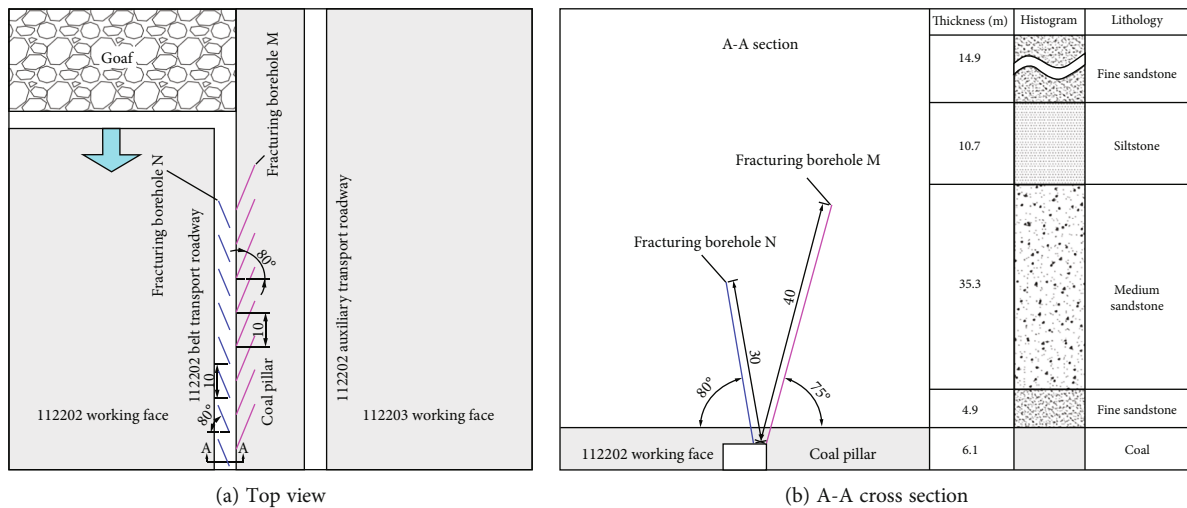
Layout plan of hydraulic fracturing boreholes.
